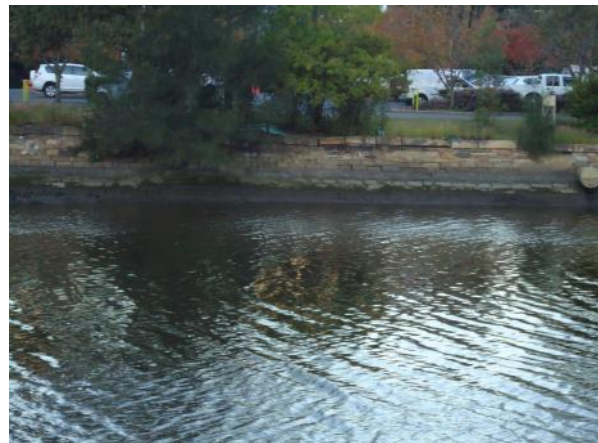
Alexandra Canal – Ashlar sandstone embankment near Ricketty Street.
